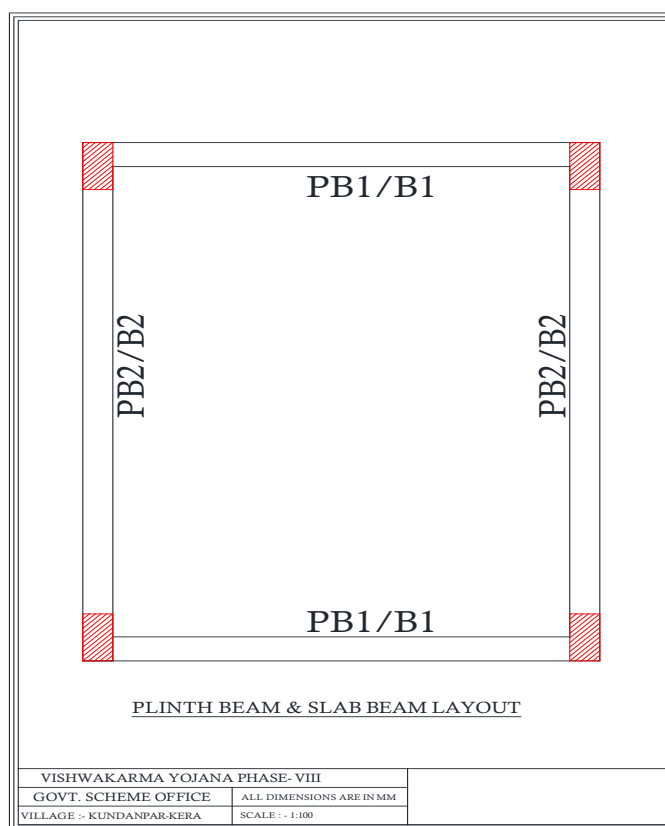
Plinth beam and slab beam layout of Govt. scheme office
